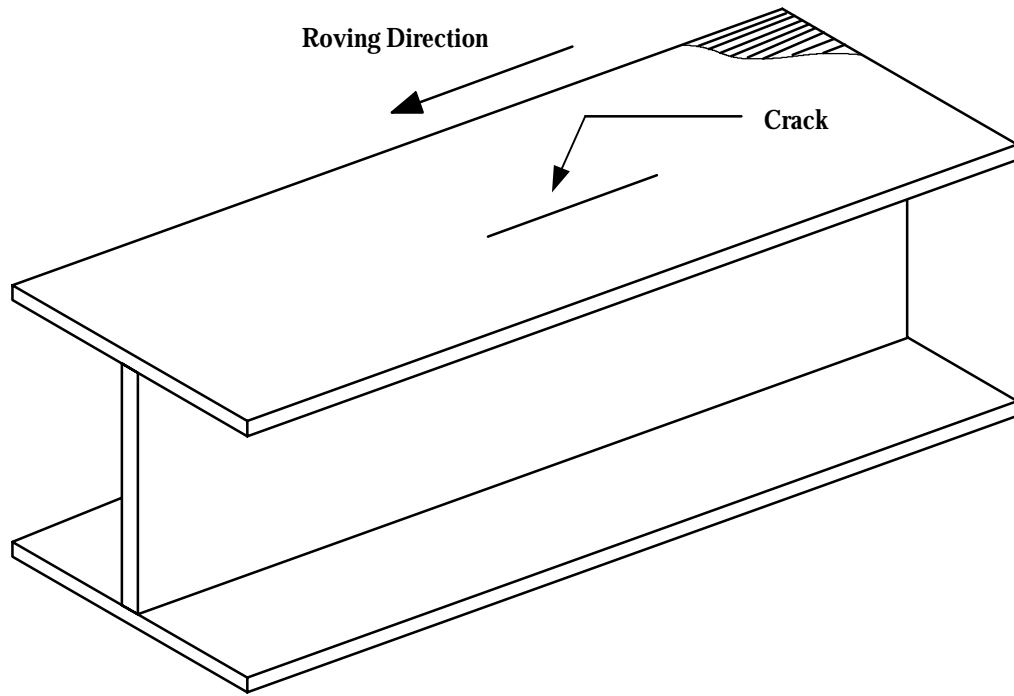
Pultruded wide flange section with a crack along the upper flange
